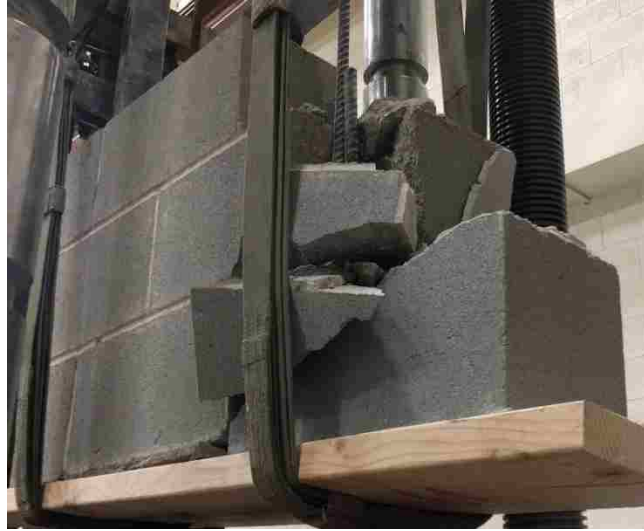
Catastrophic Masonry Splitting Failure
